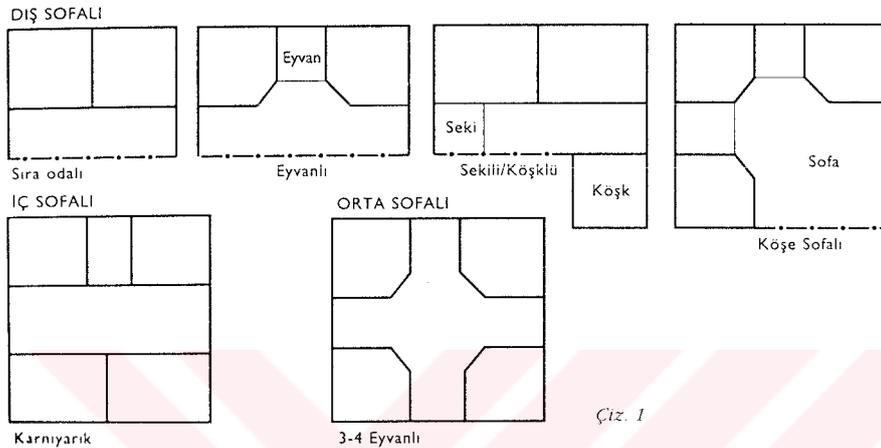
Plan Types of Turkish House. (Günay, R., 1998)
